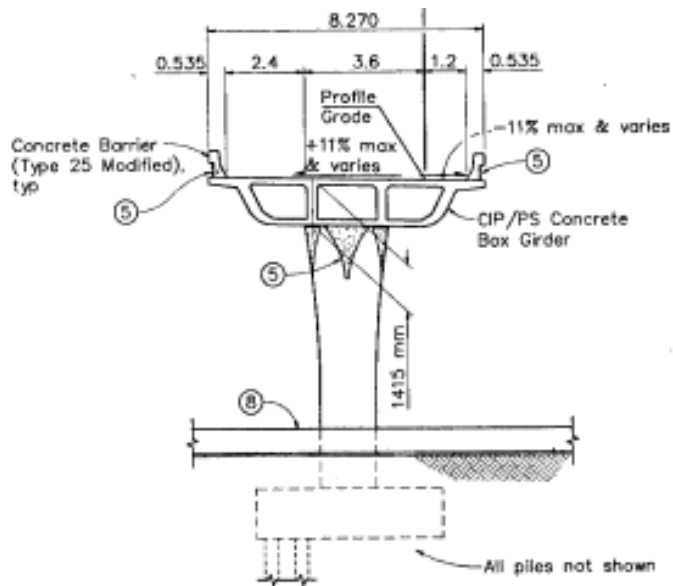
Typical section view of Bridge-A (structural drawings by Caltrans)
